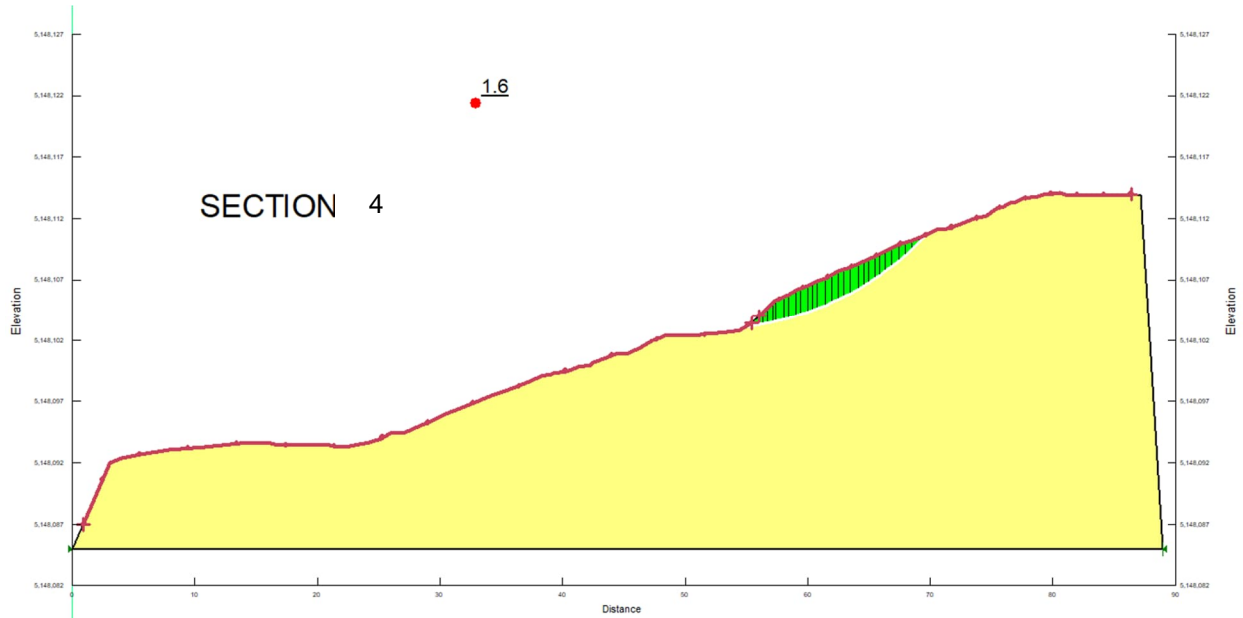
Section 4 through the upper slope behind the structure leading to the road.
